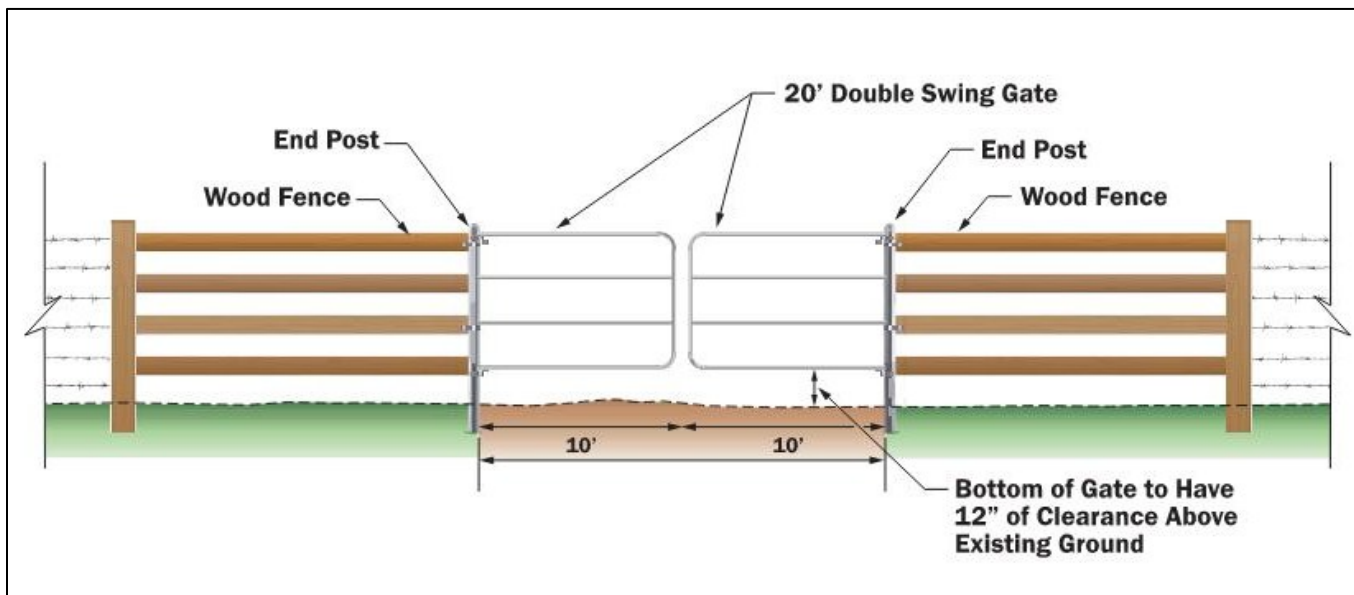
Typical offsite gate detail with wooden slats on left side for bear crossing.
